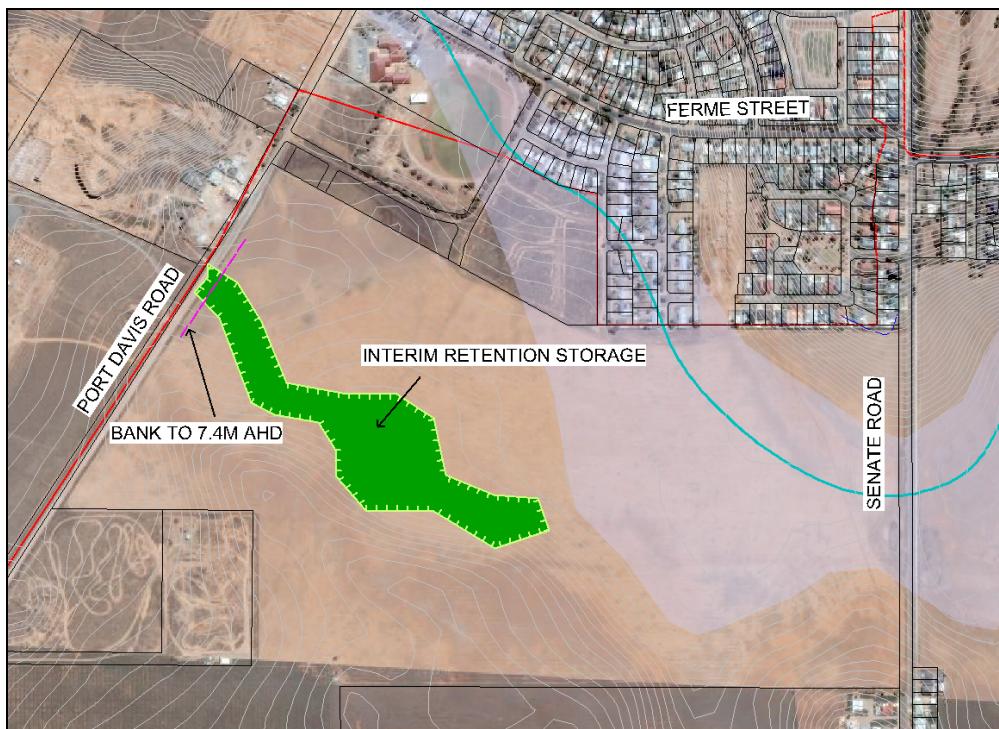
Outfall Storage Capacity within Development Area West of Senate Road
